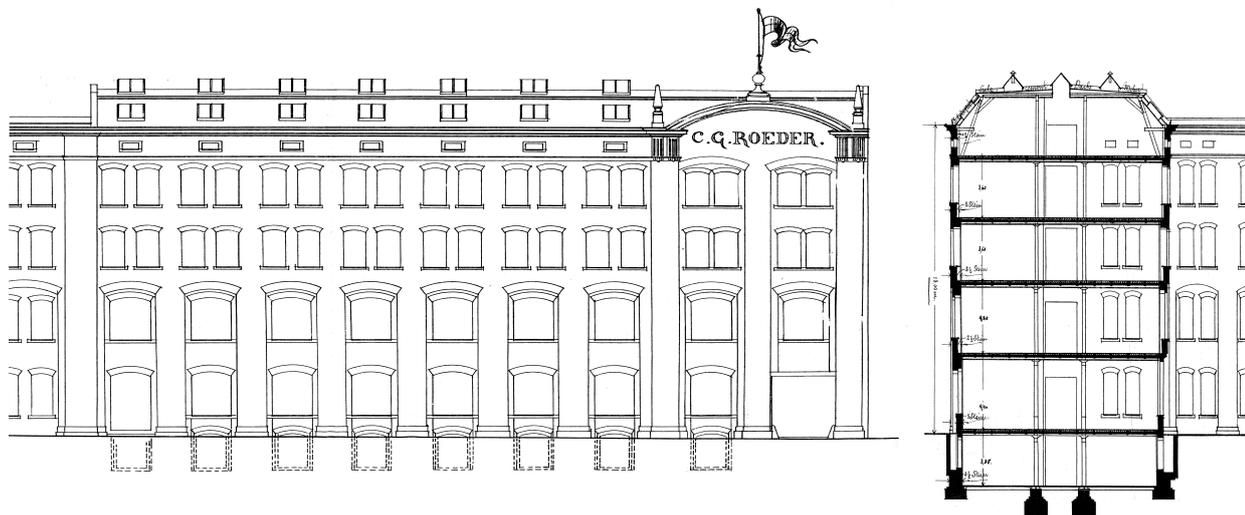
First design for the façade and cross-section, showing a traditional construction, submitted in February 1898; (Bauakte, p. 99)
